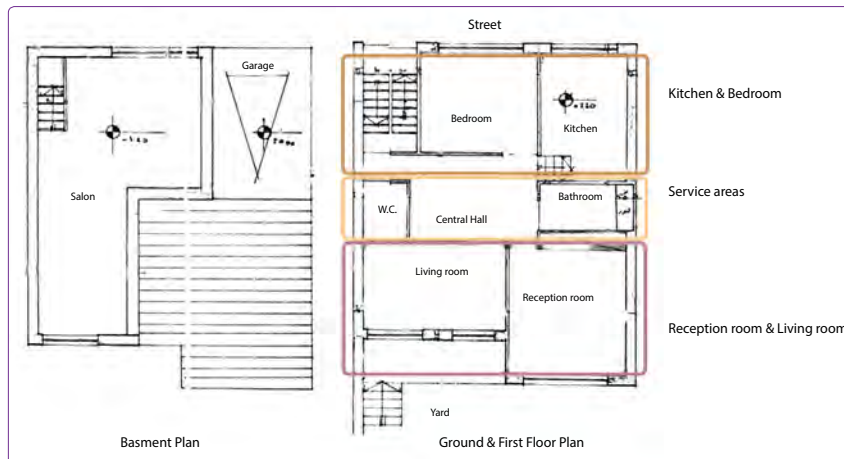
The placement of spaces in the central-hall plan layouts of houses built in the 1980s (Tabriz Municipality Archive, 2018).
